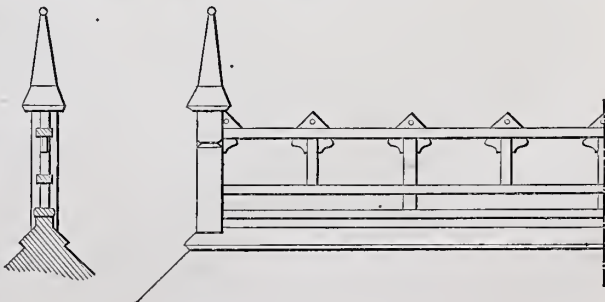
Detail of Cresting on Ridge.—Scale, 3/8 Inch to Foot.
